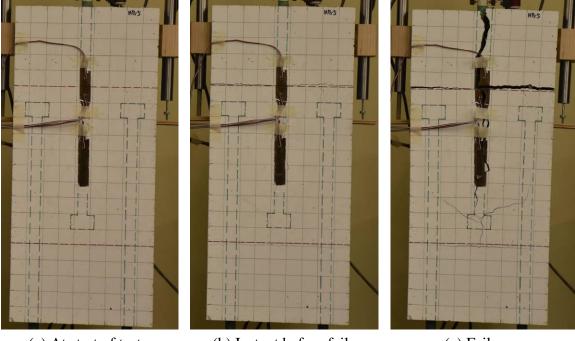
Pullout Specimen Before and After Failure – HB-4
